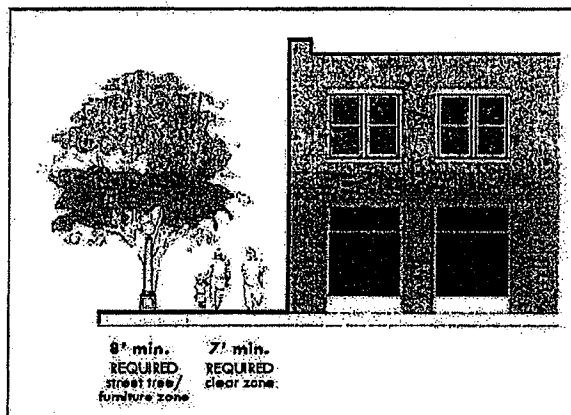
Core transit corridor sidewalk requirements. Street trees are required along core transit corridors with an average spacing not greater than 30 feet on center.
